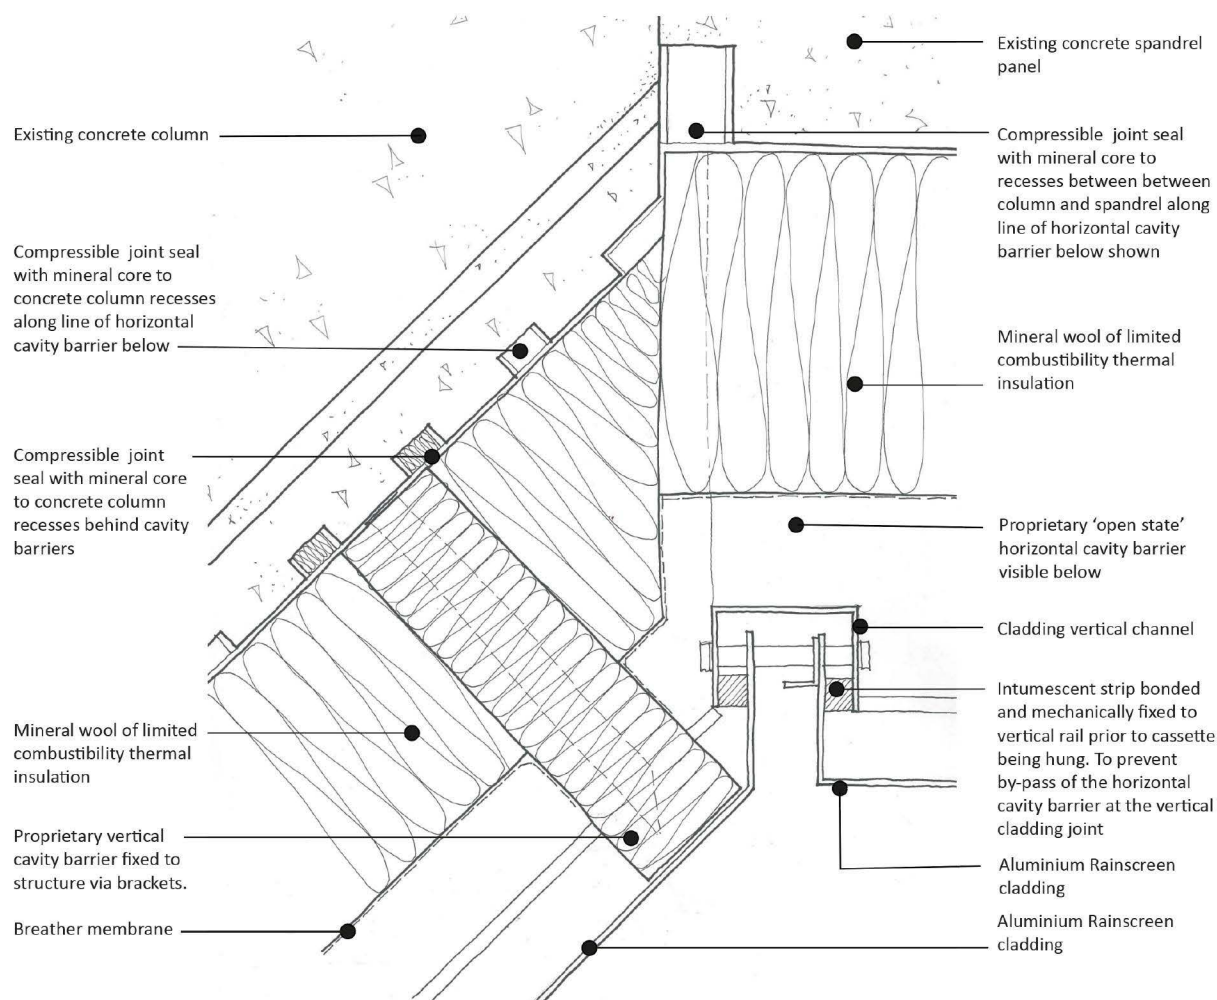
Typical Detail 3 – Head detail with cavity barrier arrangement highlighted
